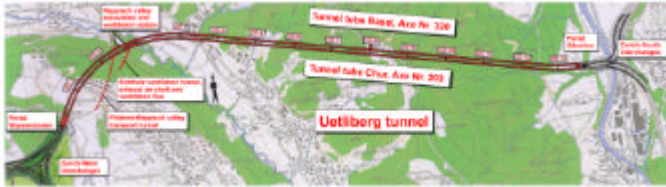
Fig. D: Overview of project N4.1.5 Uetliberg Tunnel
